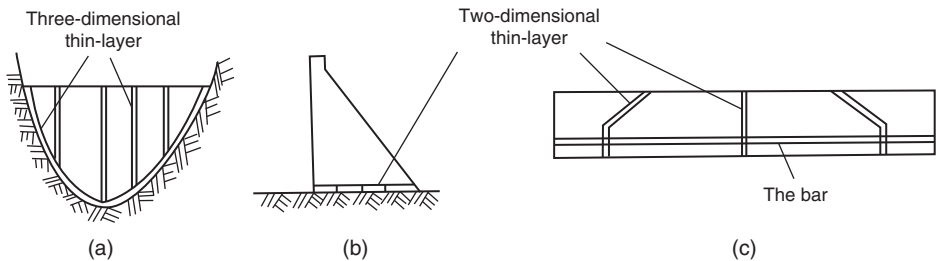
The thin-layer element for crack model. (a) The arch dam. (b) The gravity dam. (c) The reinforced concrete beam.
